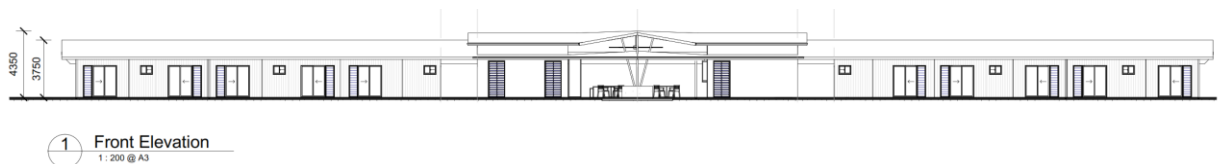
Front Elevation of Main Accommodation Building (Source: BAU Design Architects, 2021)
